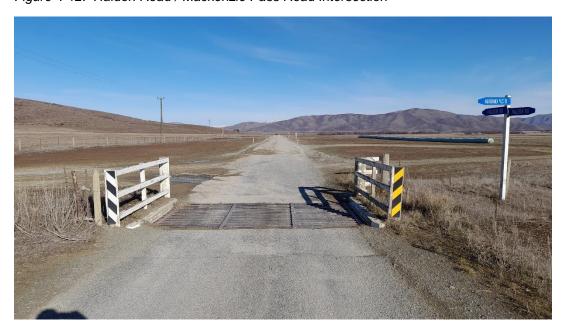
Haldon Road / Hakataramea Pass Road Intersection
